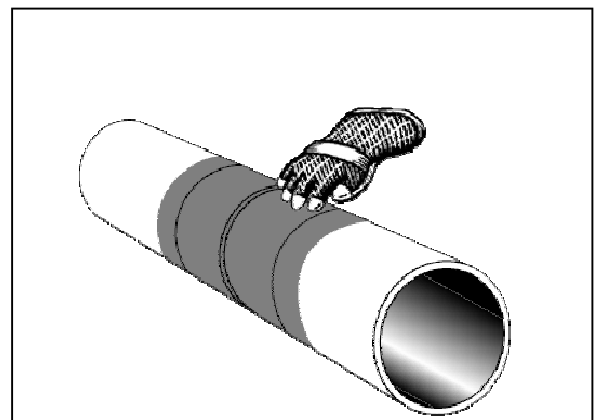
▲. Priming butt welded joints: Apply Denso Primer to entire area to be wrapped with tape.
